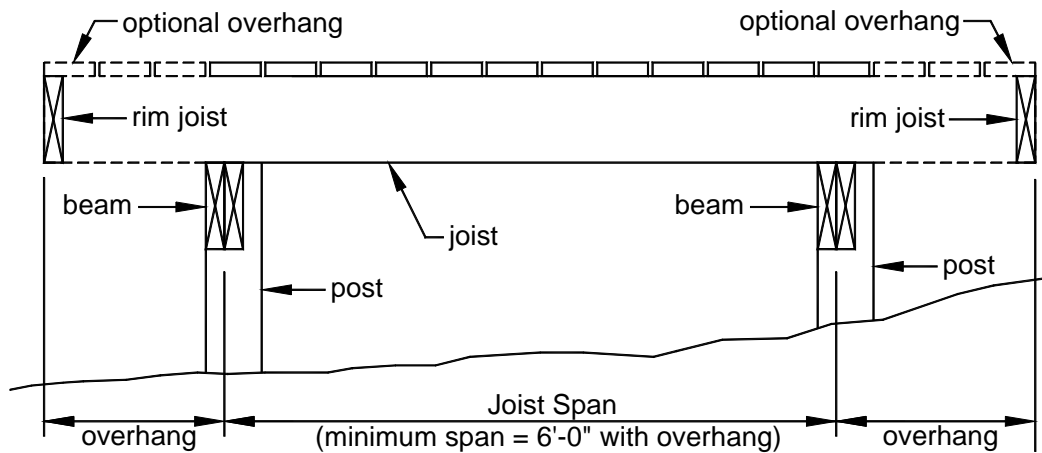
JOIST SPAN - FREE-STANDING DECK
